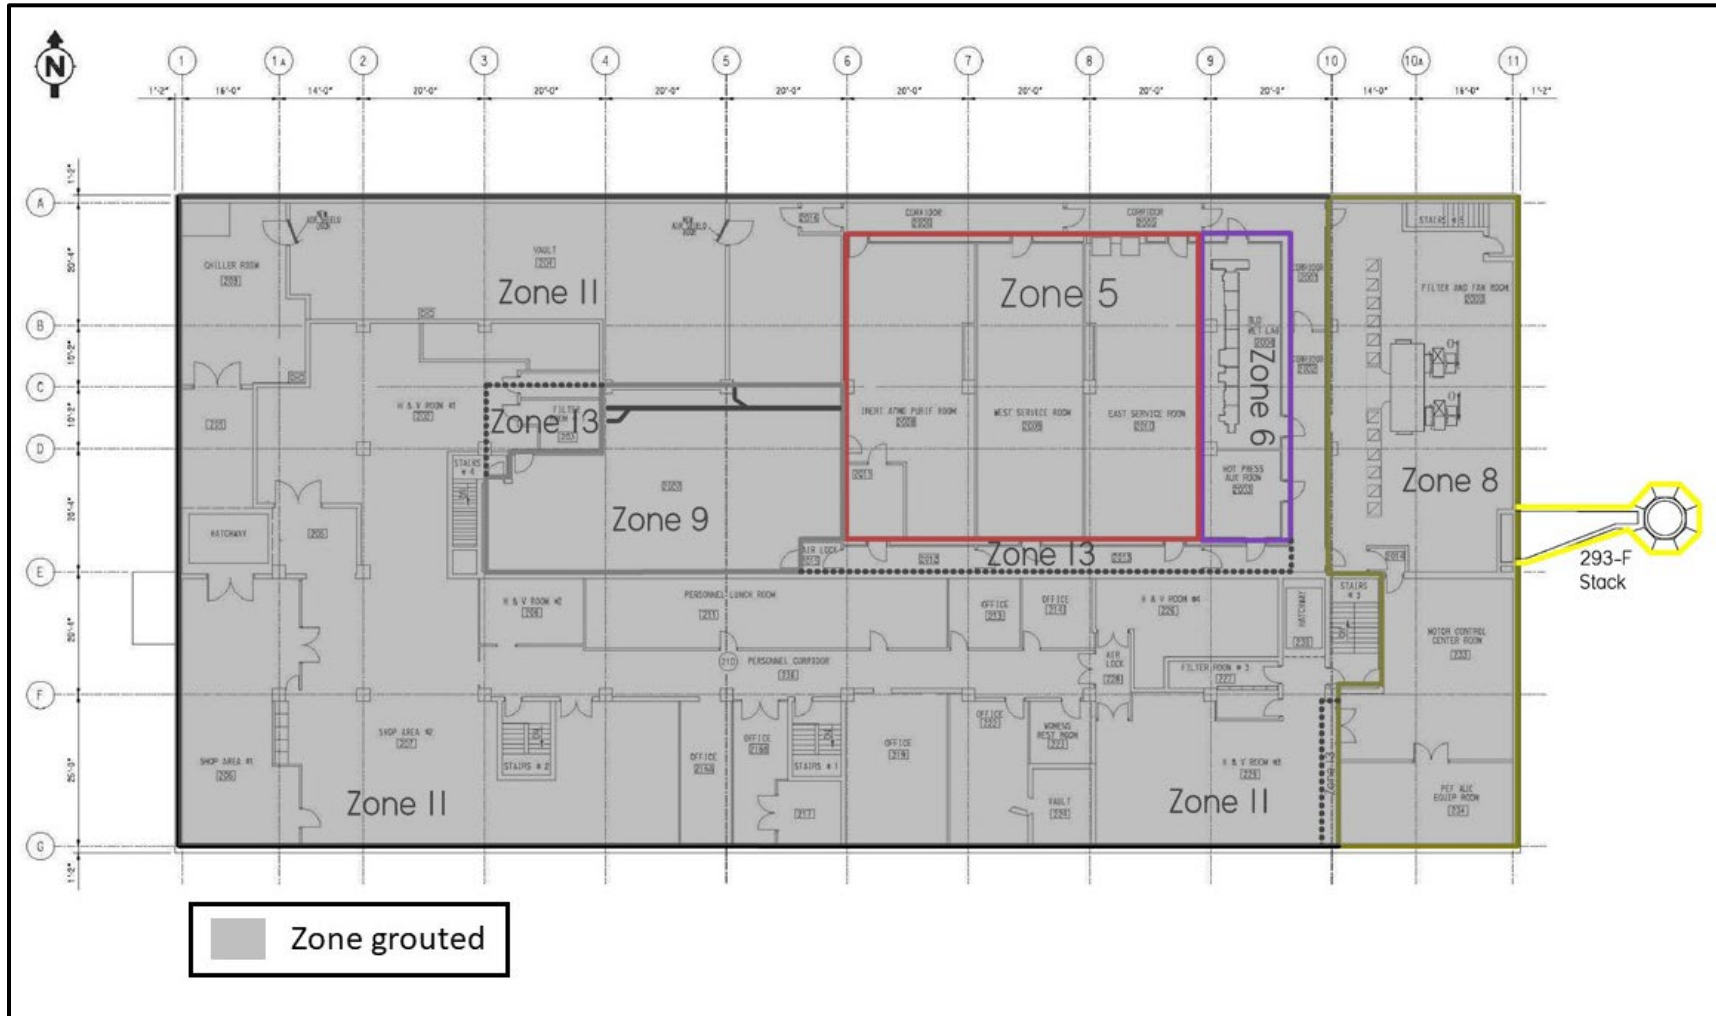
Alternative A-3. ISD of Entire Building 235-F/Engineered Roof (Second Level View)
